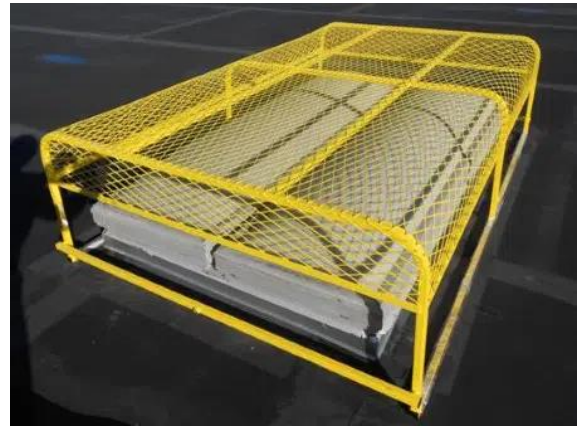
Skyguard Skylight Screen, [Edge Fall Protection \[2023\]](#)
